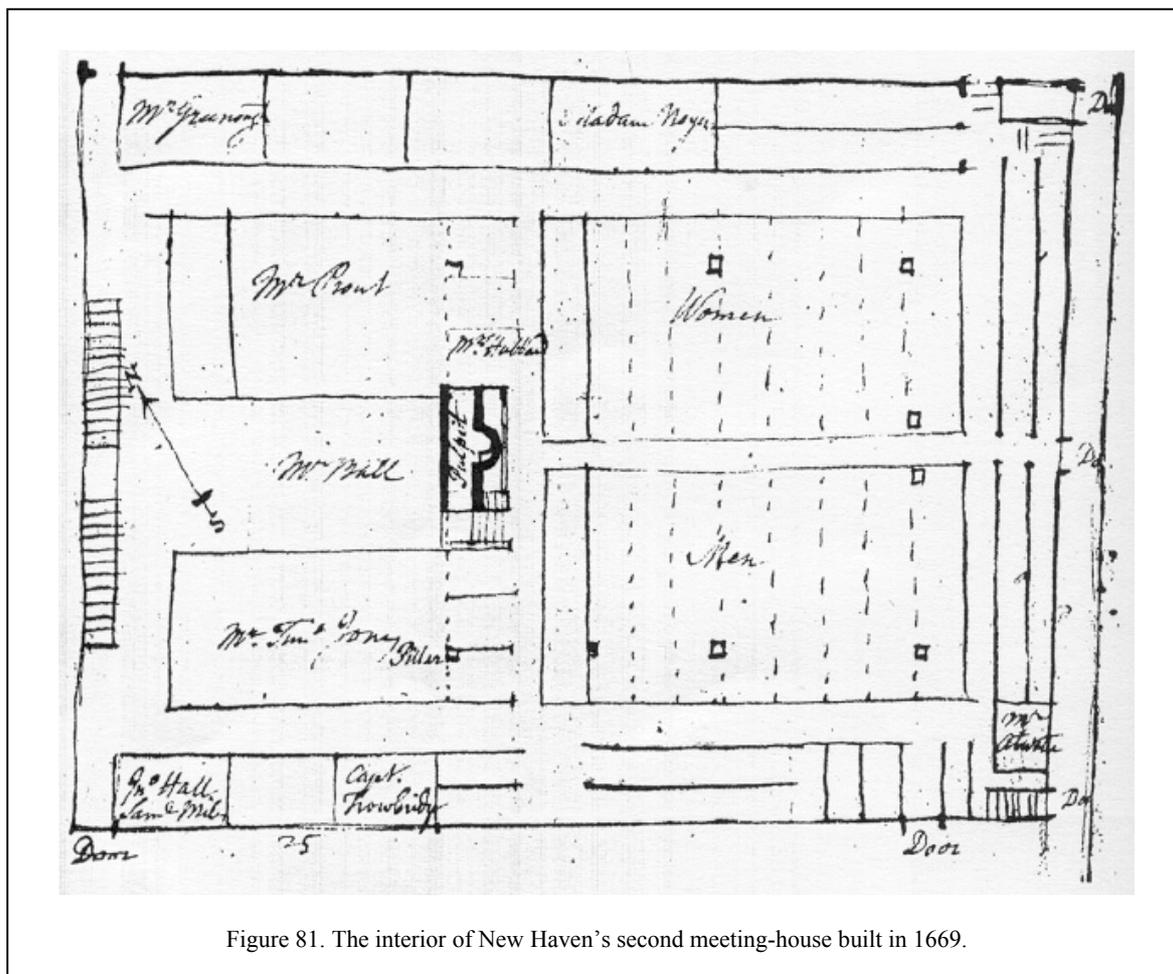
The interior of New Haven's second meeting-house built in 1669.
